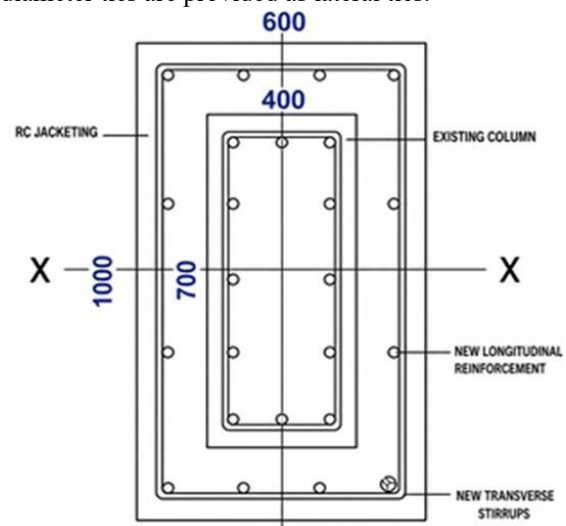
Geometry and Reinforcement details of C3 RC Jacketed column in Section designer.
